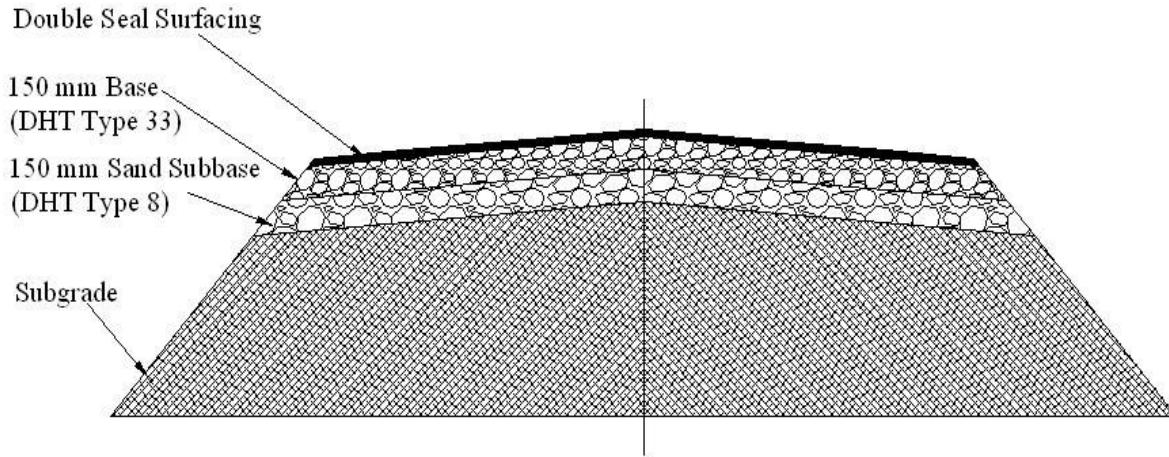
C.S. 15-11 Pavement Structure Prior to Construction
